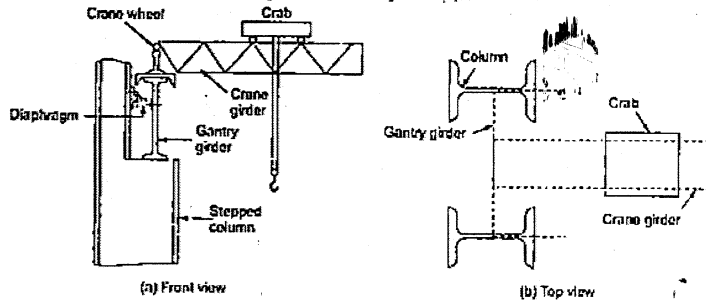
Typical arrangement of crane girder, gantry girder and the supporting column
